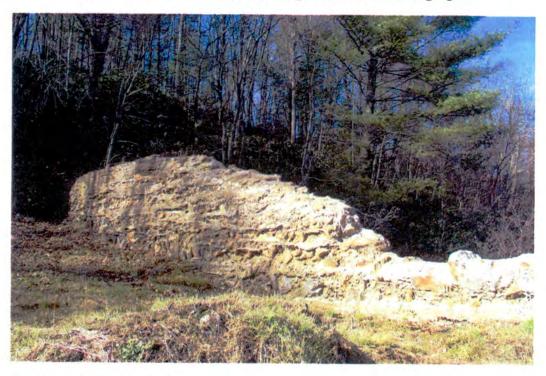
Looking upstream (southeast) from the former concrete dam.
